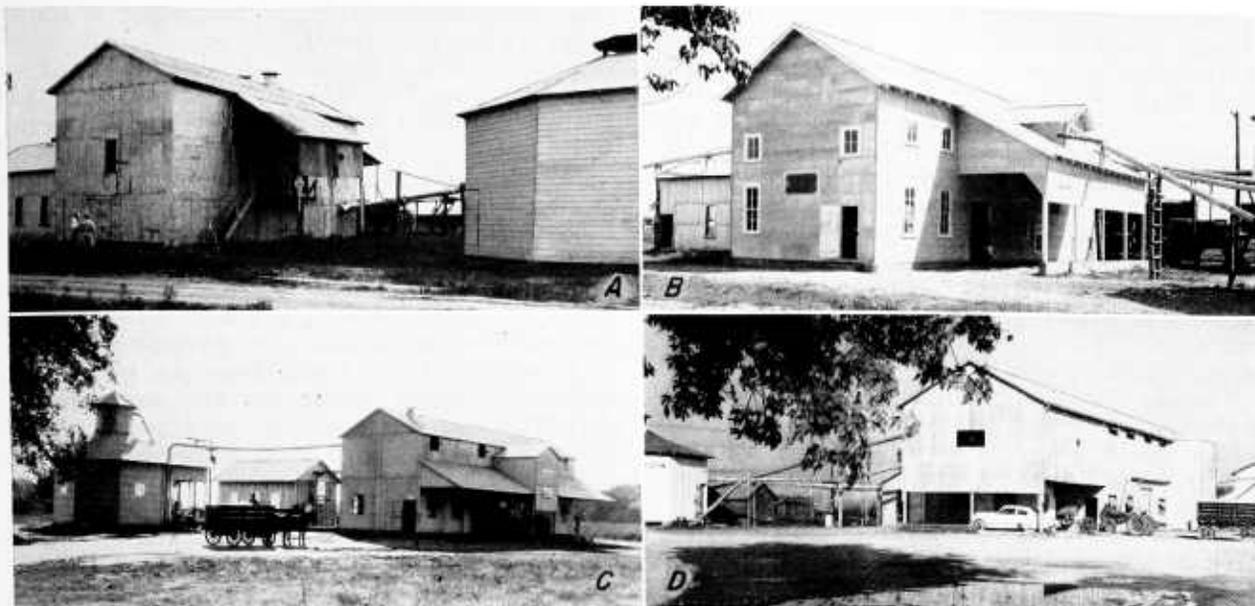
Cotton-gin buildings: *A*, Old-type 2-story steel-sheathed building; *B*, 1½-story steel siding on wooden framing; *C*, all-steel, inside and outside with cantilever wagon shed; *D*, all-steel inside and outside, with 24-foot plate and high roof.
